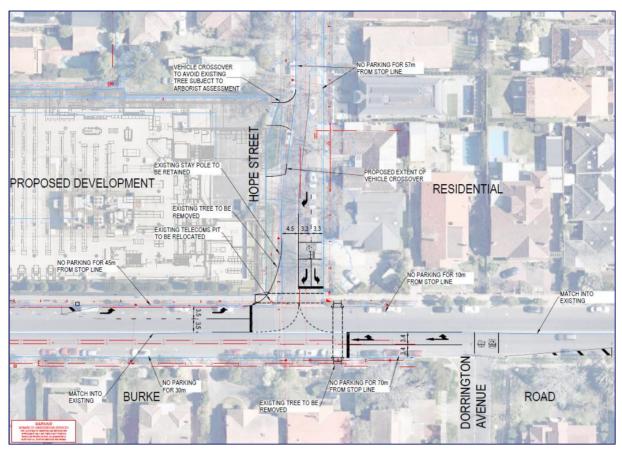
Previously proposed signalisation of Burke Road and Hope Street intersection and works
